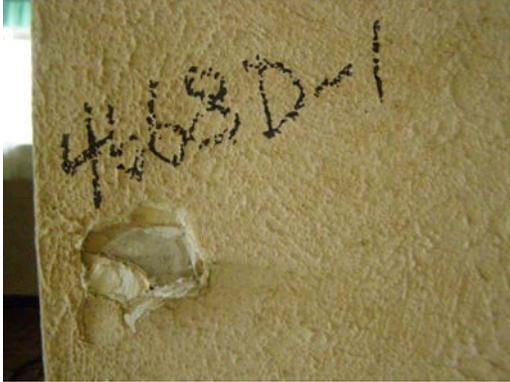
Drywall/Text. Paint (4668D-1) Living Room, Wall B. Trace <1% Chrysotile Asbestos Detected (Textured Paint PC=1.25%).
